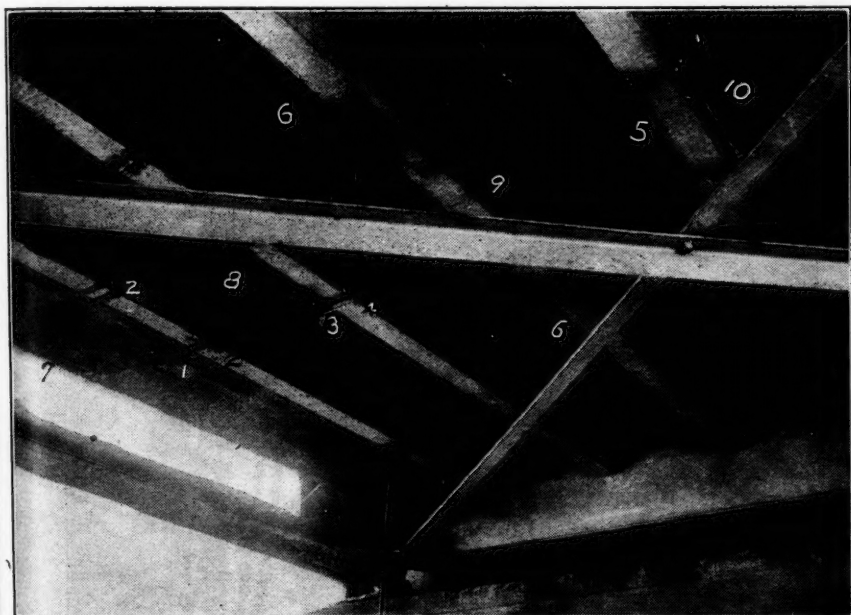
STREAMMATOGRAPHS AND EXTENSOMETERS ON BOTTOM FLANGES OF STRINGERS, SKUNK RIVER BRIDGE.
